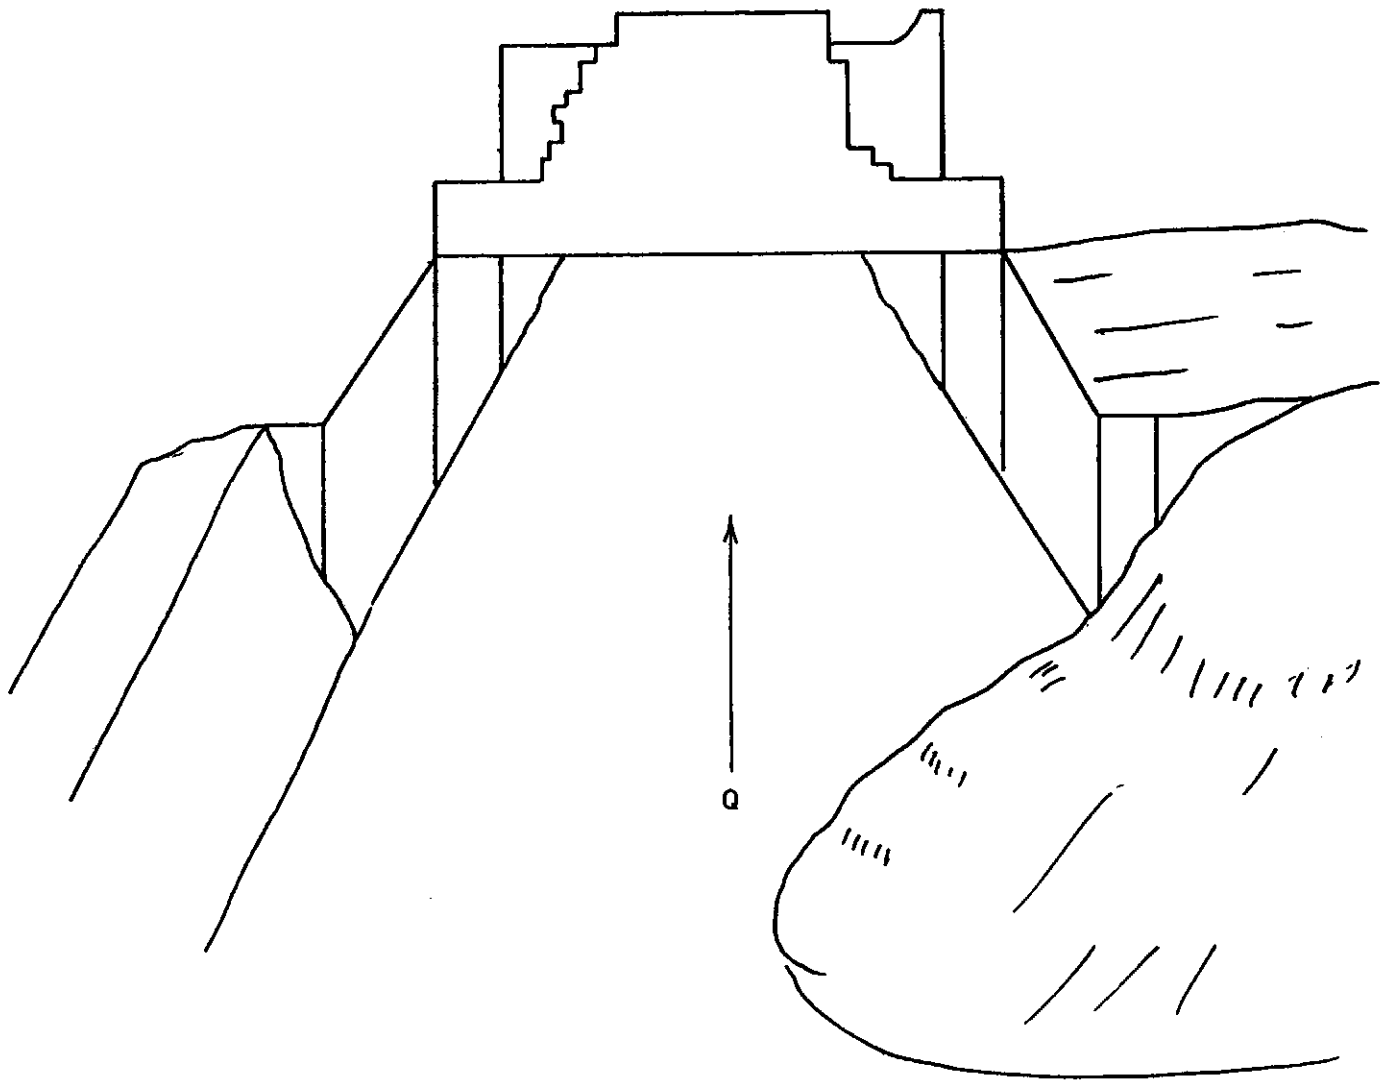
Typical structure of a culvert at Bareji Distributary, Mirpurkhas District.
